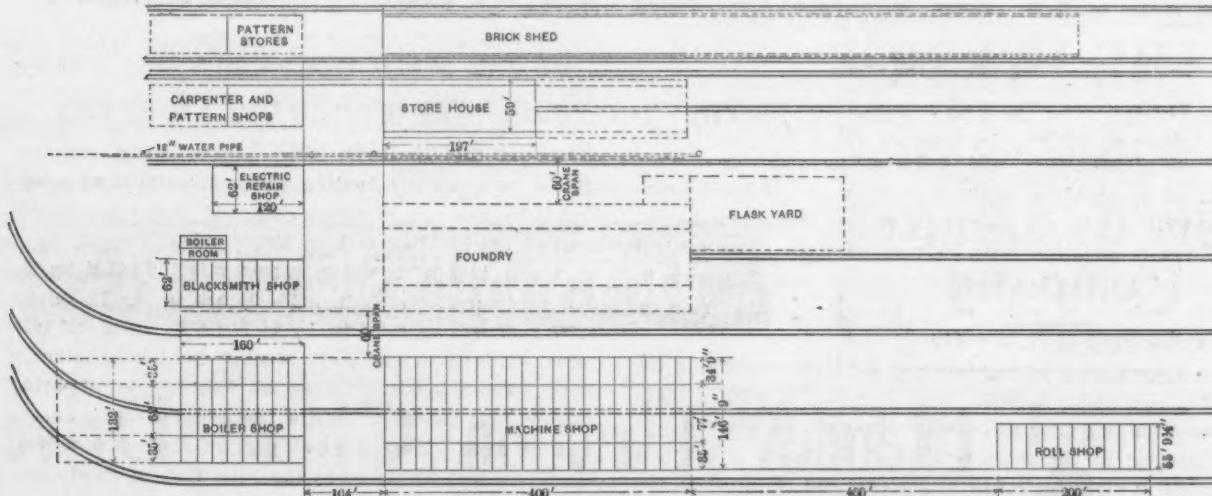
Location Plan of the Shops, Stores and Foundry of the Indiana Steel Company.
